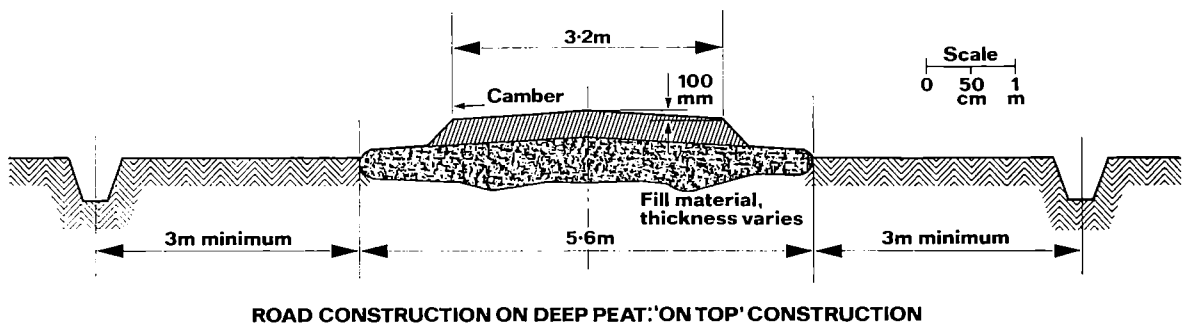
Cross section through a typical road built over deep peat using the "on top" construction method.
